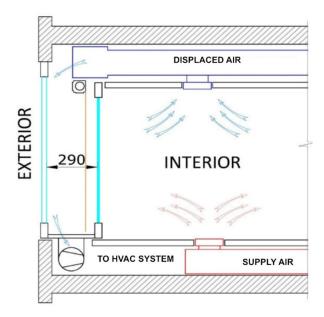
Double-skin façade on Brussimo building, Brussels, Belgium
